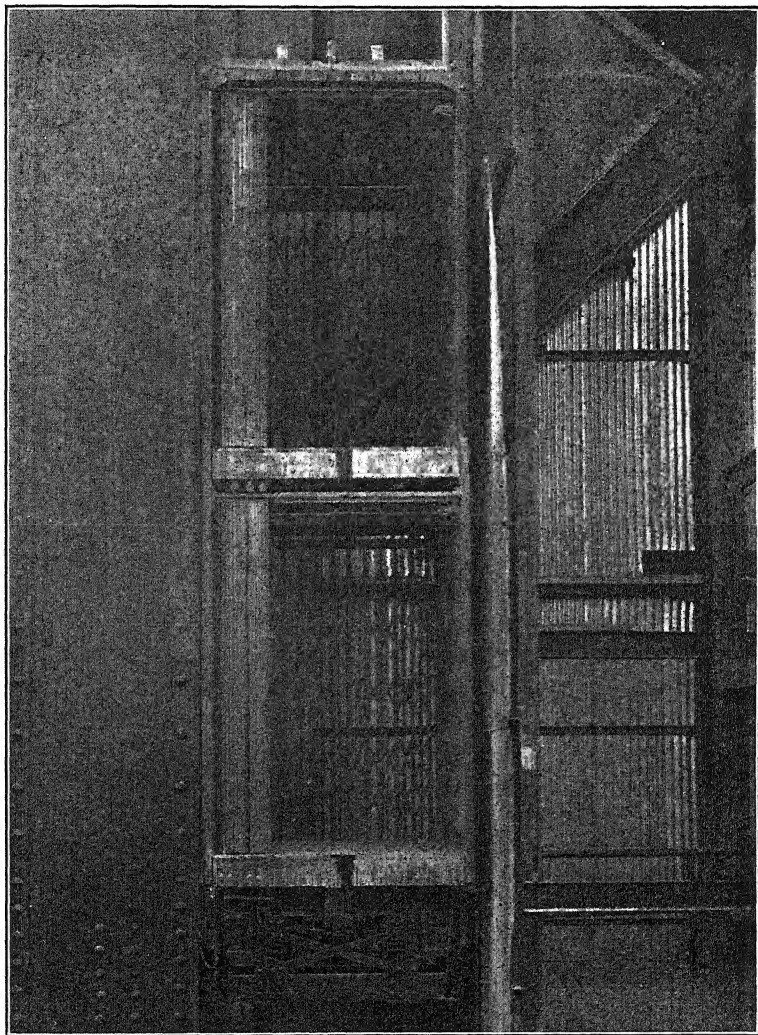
OTIS ELEVATOR AT INSPIRATION SHAFT.
